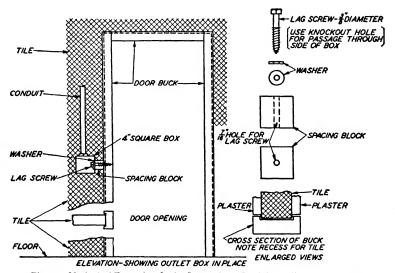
Method of Fastening Outlet Box to Door Buck in a Tile Partition Wall
